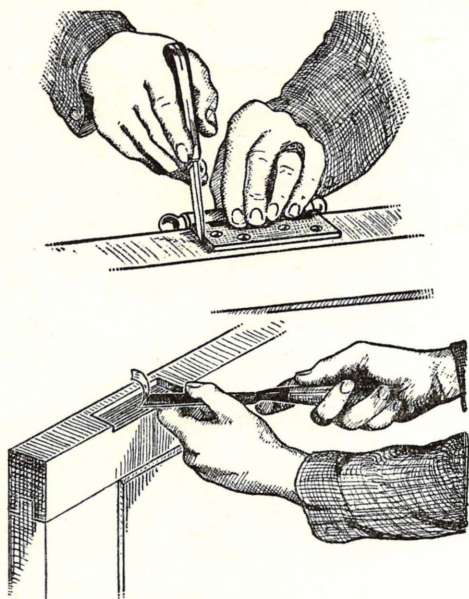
A butt hinge is gained into the edge of the door and fastened with screws. (a) Mark location of the hinge with a knife. (b) Remove the wood with a chisel
